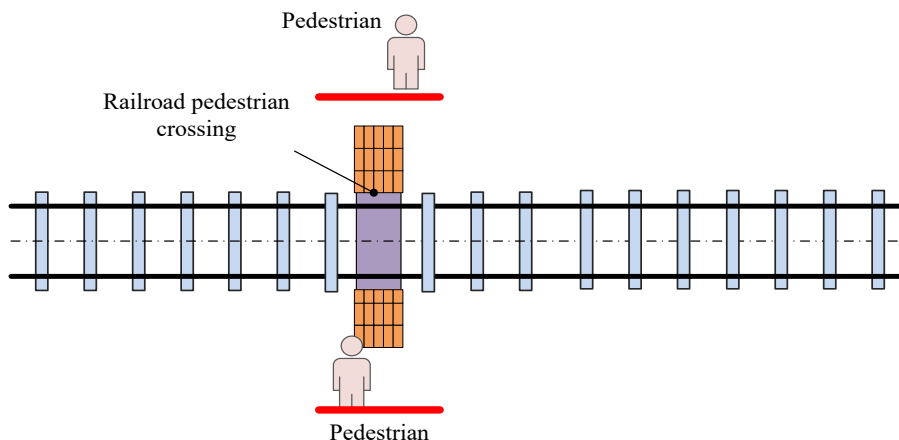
Scheme of a railroad pedestrian crossing outside an existing railroad crossing
